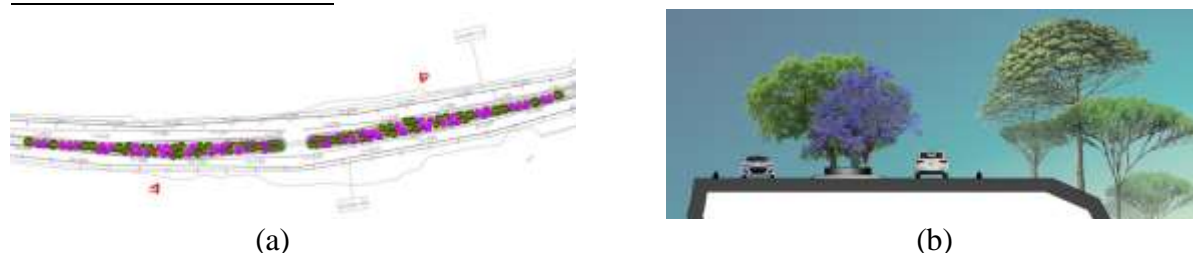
Second intervention area: Divergent Median. (a): Plan (b): Section
